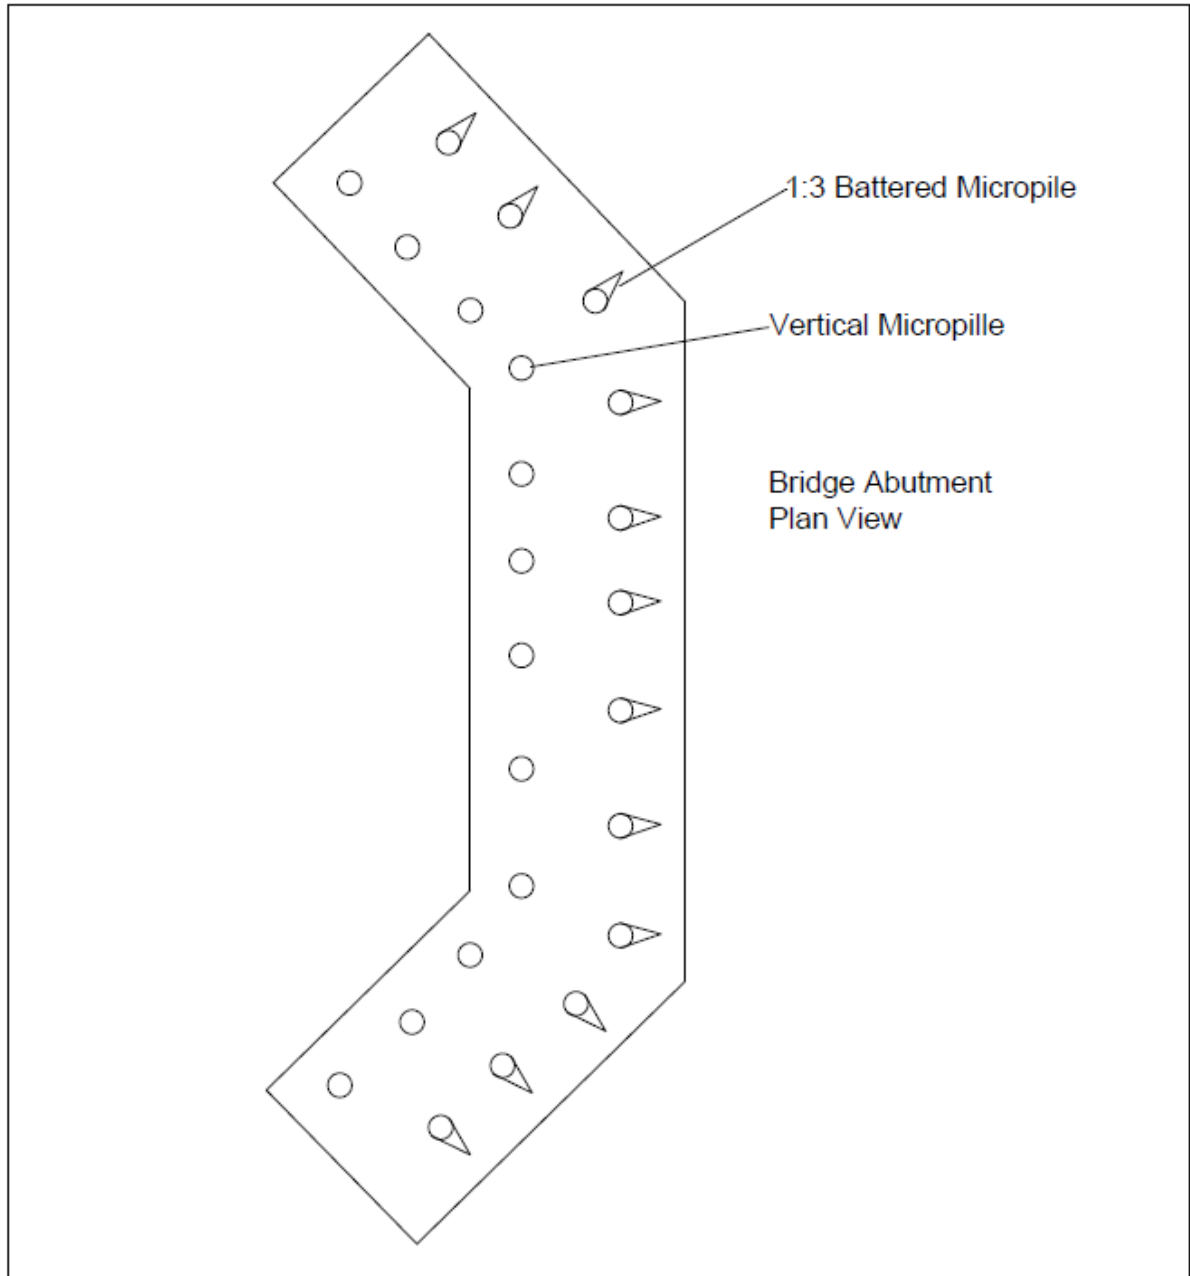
Bridge abutment micropile plan view ("Grove Road Bridge Replacement," 2014)
